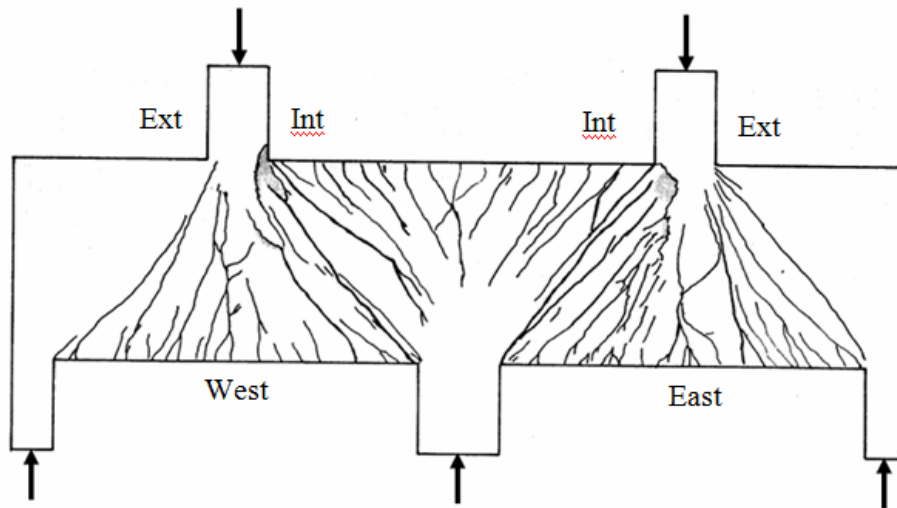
Crack pattern at failure of beam BM 5/1.0
